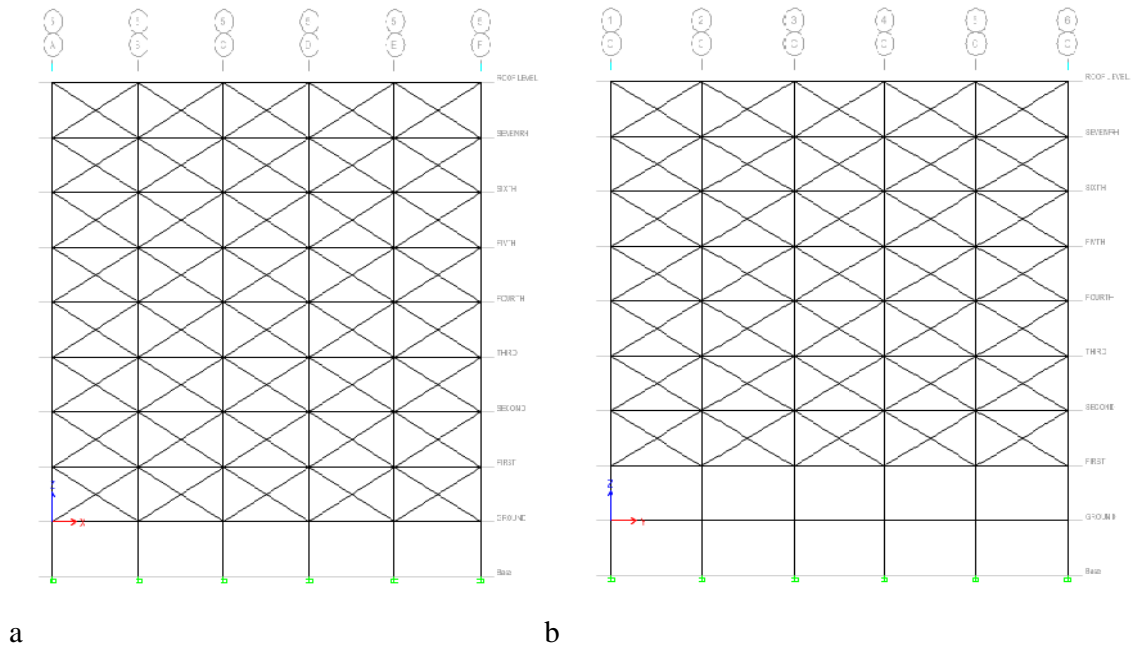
Elevation View. a) For base infilled frame b) For soft ground story frame
